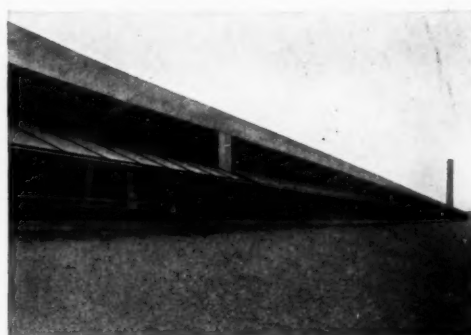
A typical installation of Fenestra Center Pivoted Continuous Sash in the Michigan Stamping Company, Detroit. Note the wide openings for daylight and ventilation above and below the pivoting of the sash.
